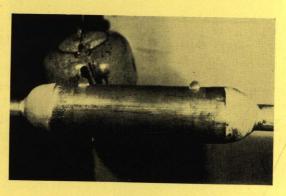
Filling the joint with compound through V-shaped knife cuts.
